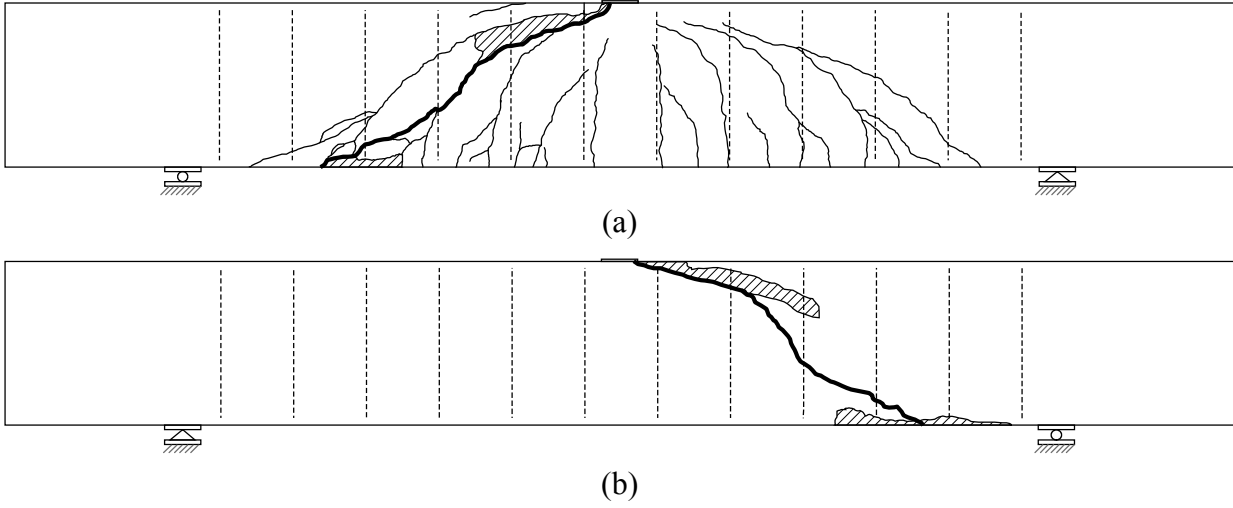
Observed damage in specimen P3S9, (a) front side, (b) back side
